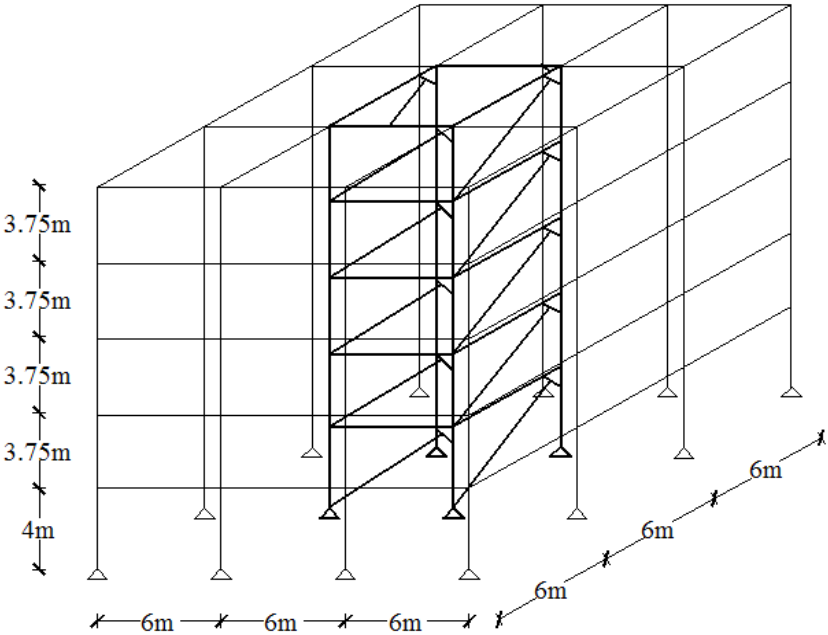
Symmetrical Plan and Section core knee bracing.
